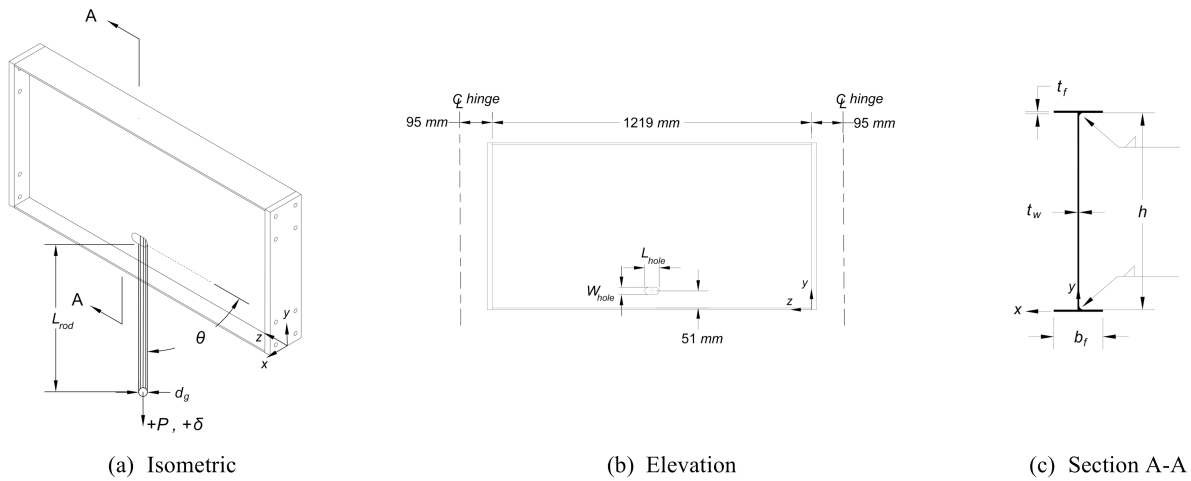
Metal building primary frame steel plate girder specimen dimension nomenclature
